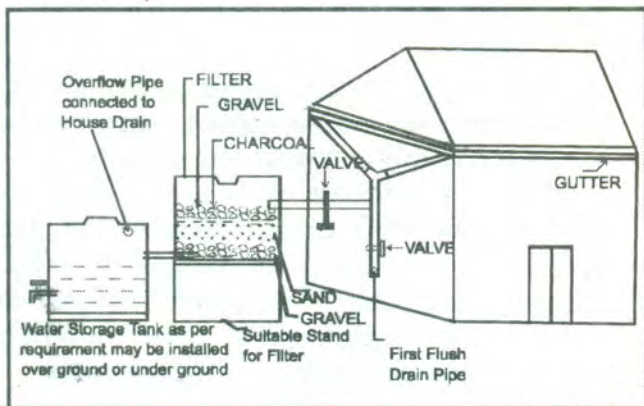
Roof rain water can be stored in tanks for drinking and cooking
